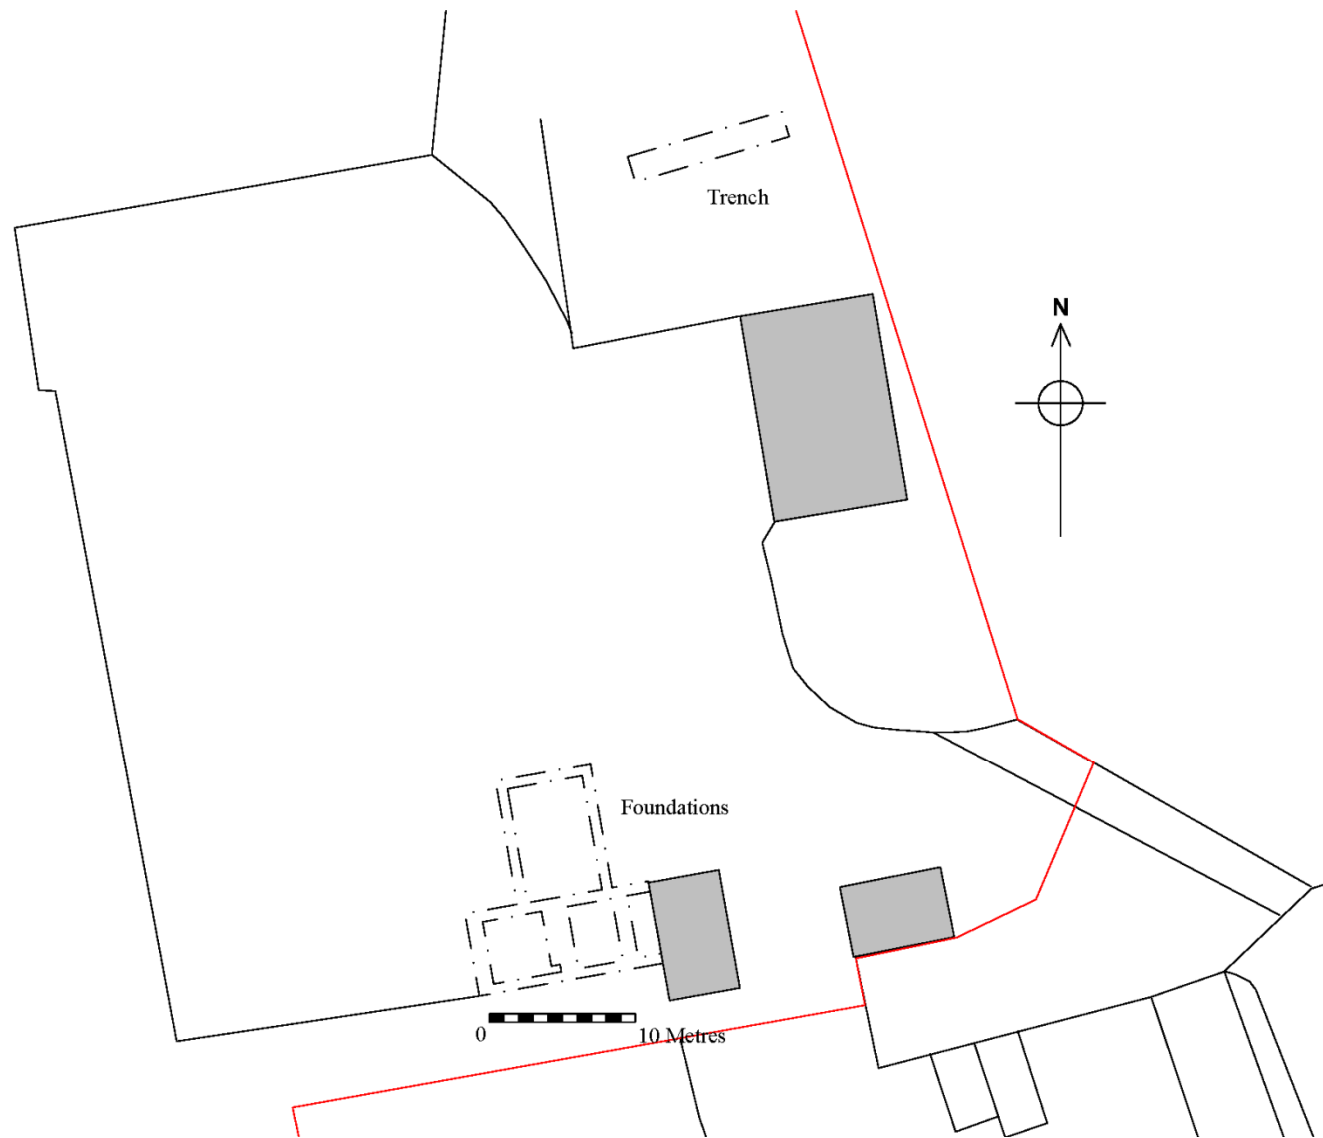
Site plan showing location of archaeological attendance to the south and initial trial trench to the north-east.
